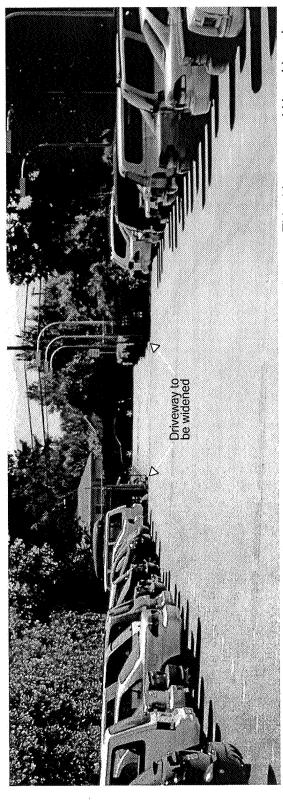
View of main entrance to school, looking to the east towards Plummer Avenue. This driveway would be widened as part of the proposed project.
